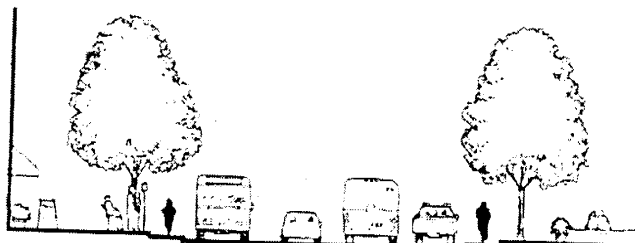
Cross-section of a bike lane between travel lanes and the curb
